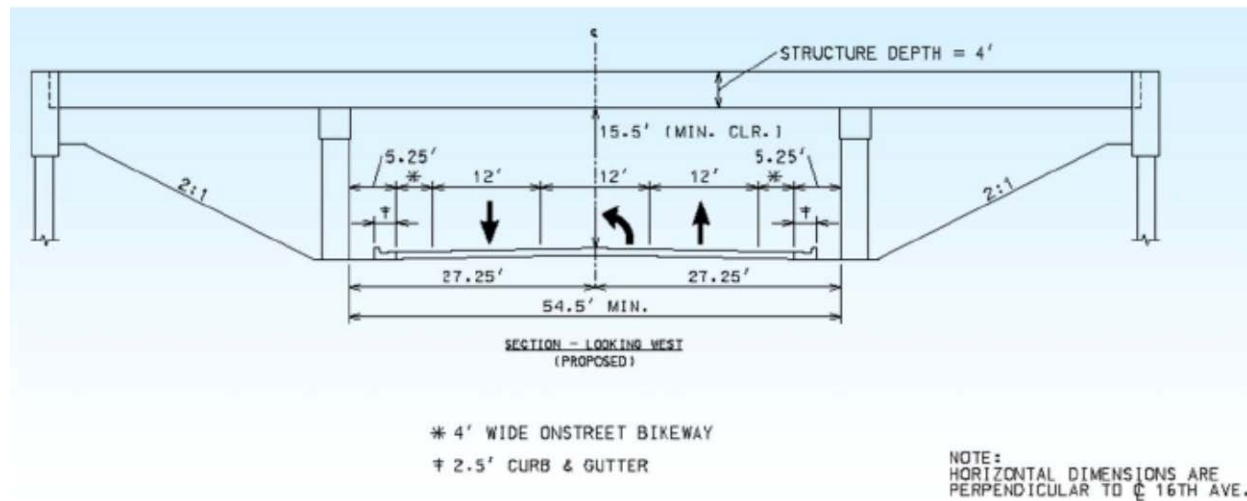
New element: proposed cross section of 16th Avenue under the new bridge.
